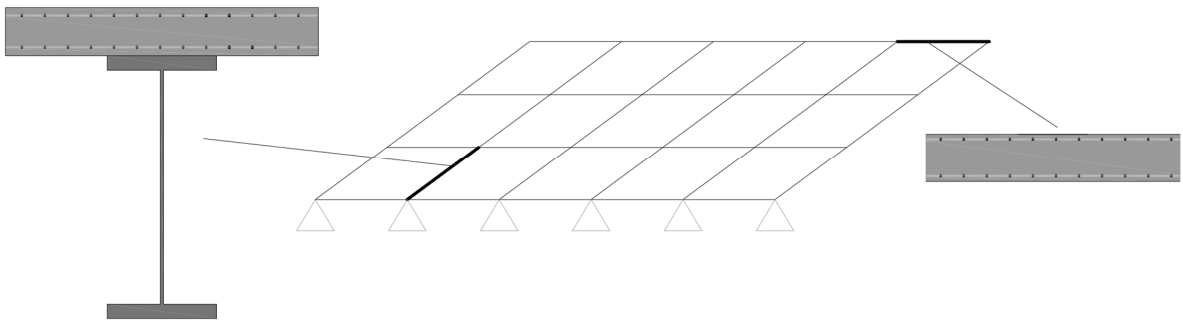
Typical Grillage model for a multi-girder bridge.
